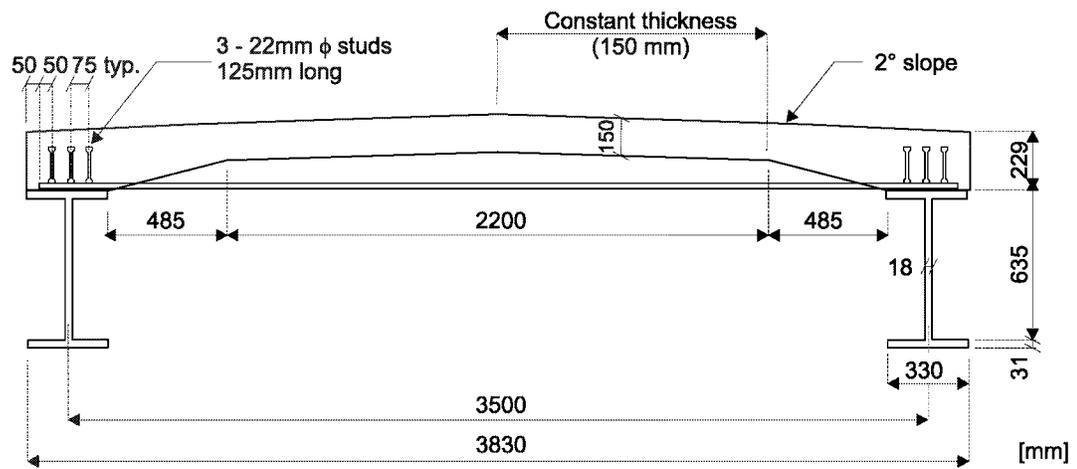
Typical Cross-Section of Experimental Arch-Panel on Steel Support Beams
